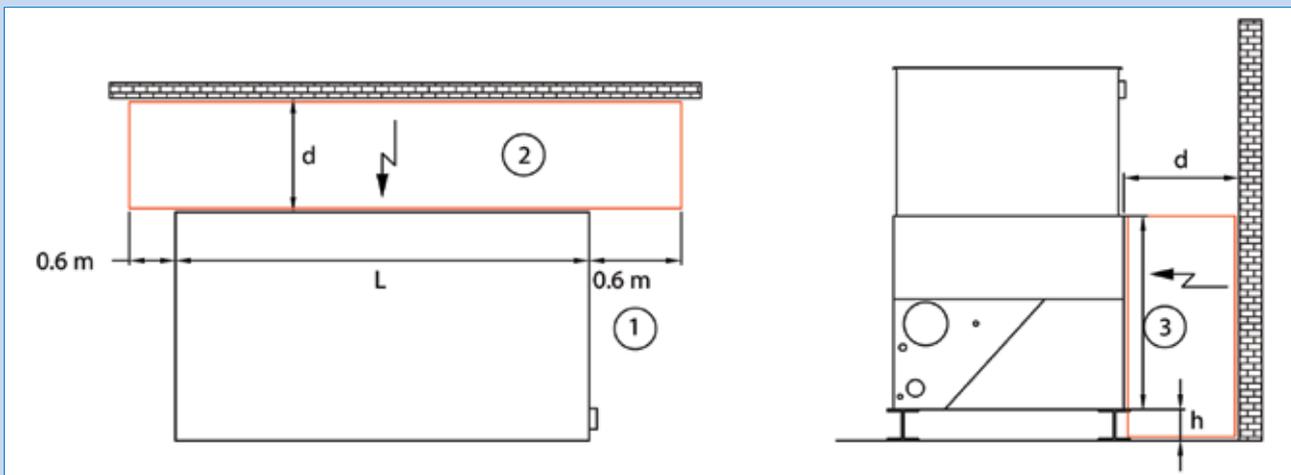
Unit with Single Air Inlet adjacent to a Wall
